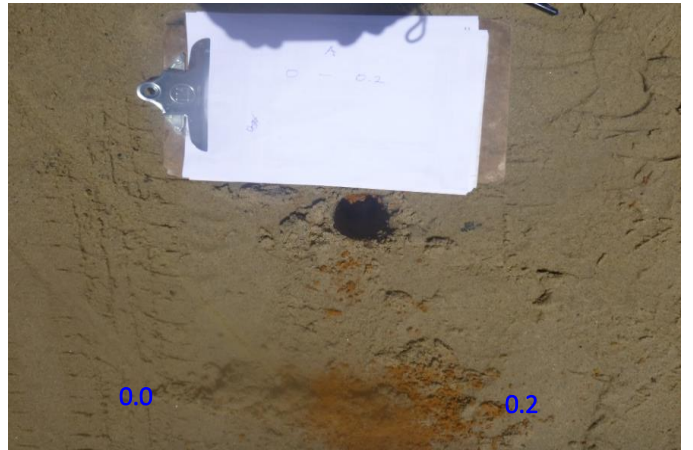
Soil cuttings borehole A (0.0-0.2m)
